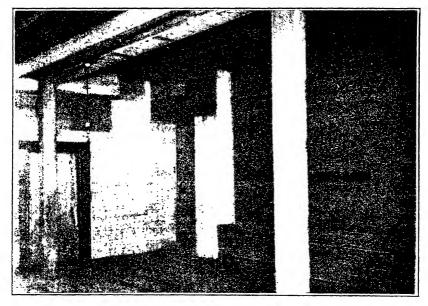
Precooling Room in an Orange-Packing House at Upland, Cal., Showing Air Ducts for Distributing Cold Air through Perforated False Floor and Ceiling.
